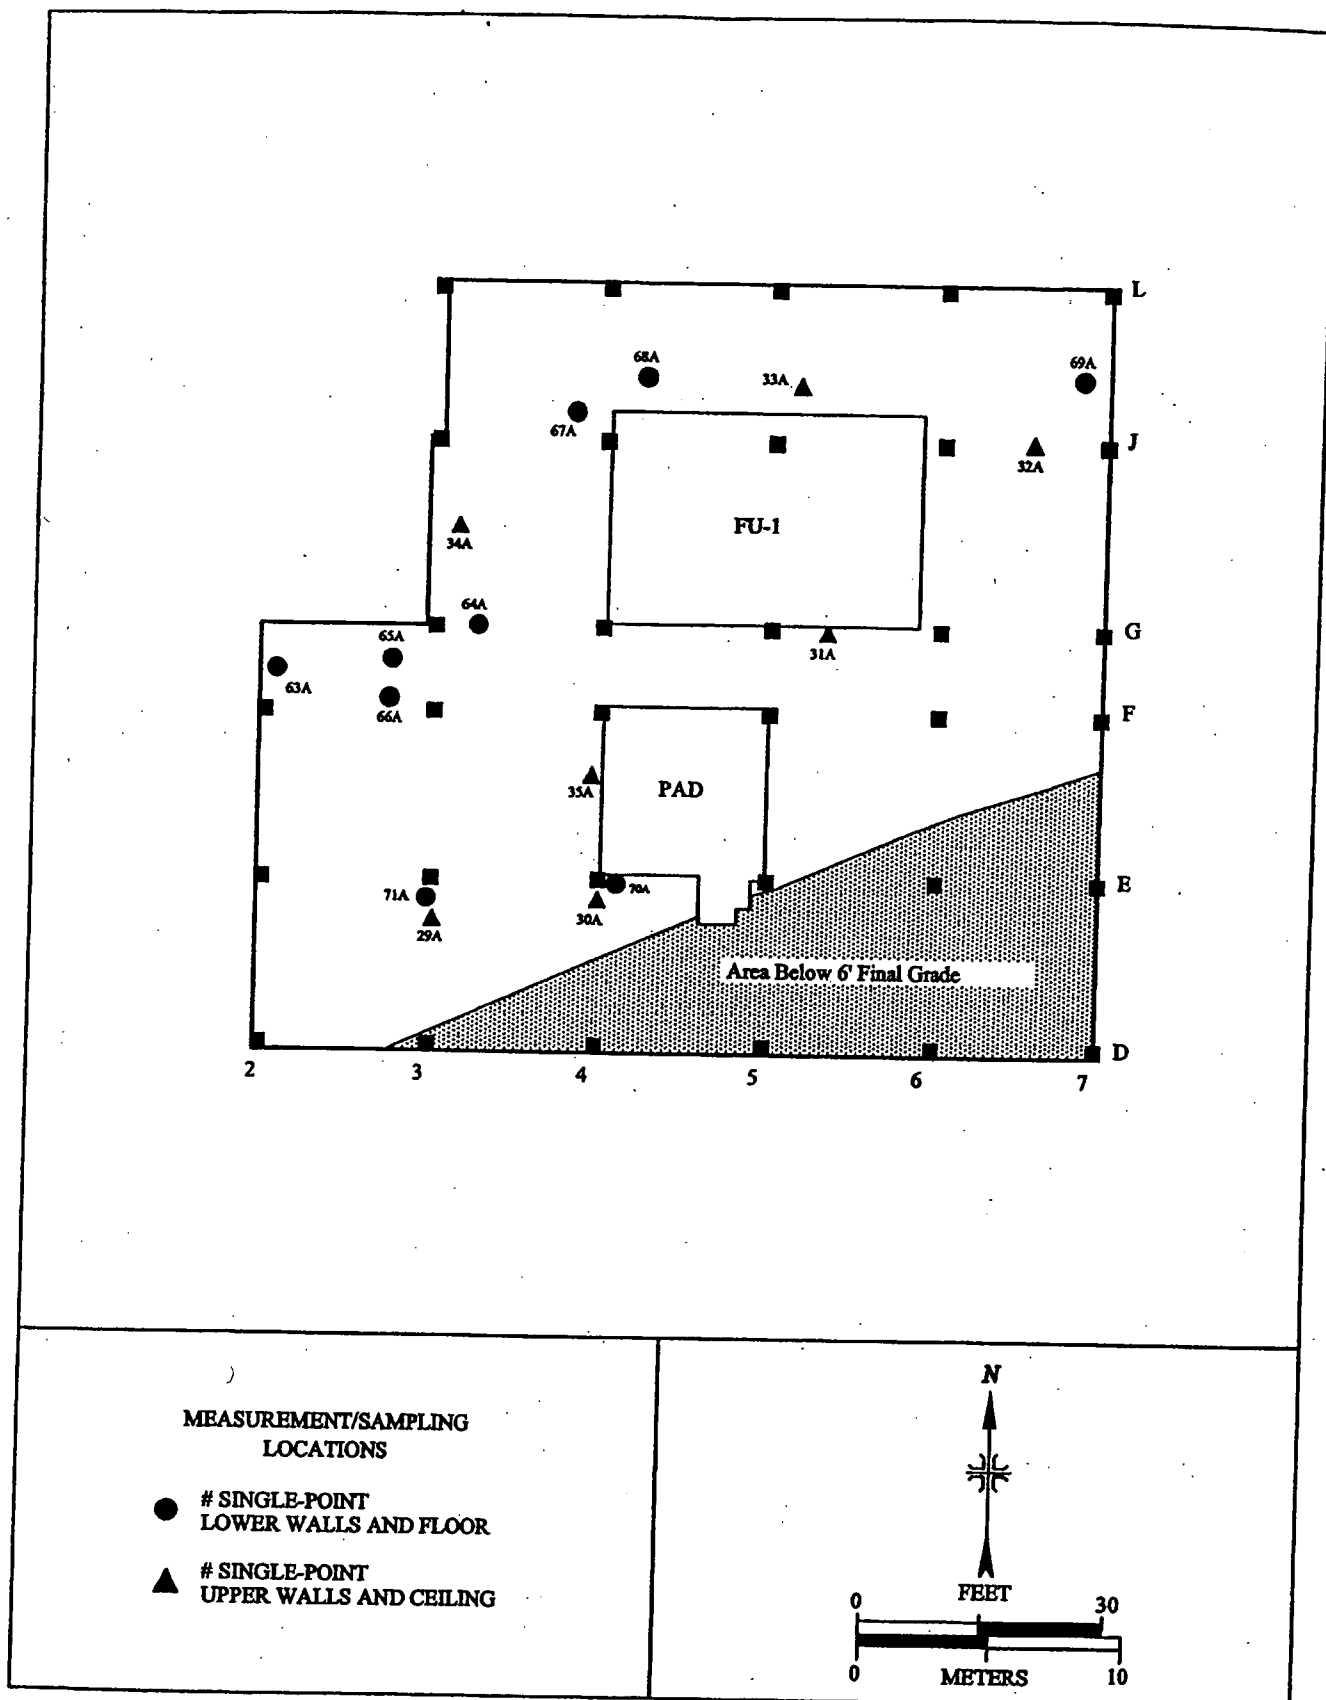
Building 771, Second Floor, Survey Unit-771041, Area AH- Measurement and Sampling Locations
